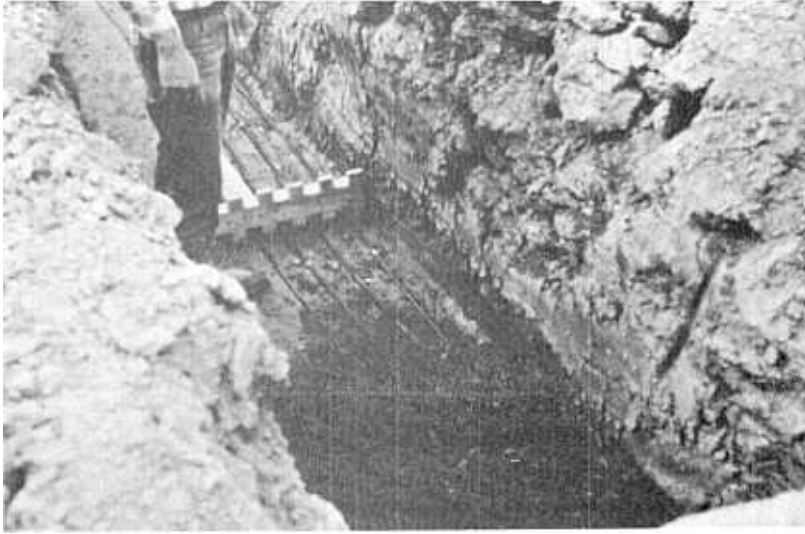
Installation of piezometer tubing in trench. P801-D-81008.
